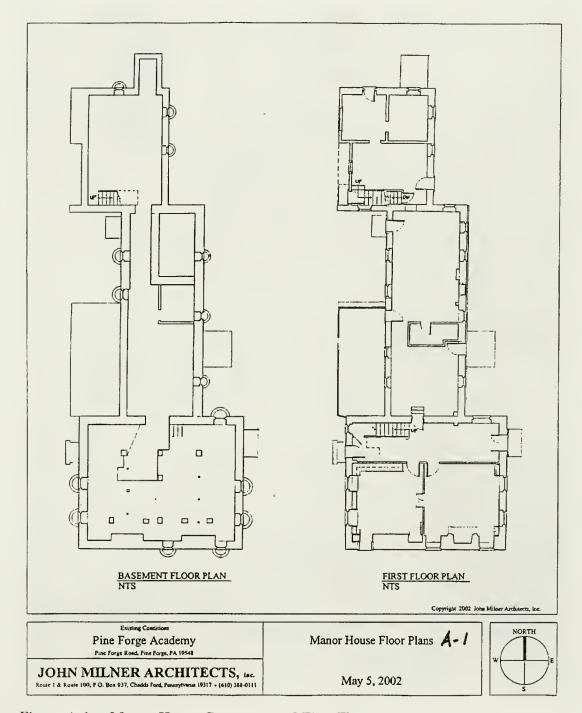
Manor House, Basement and First Floor Plans, 2002
